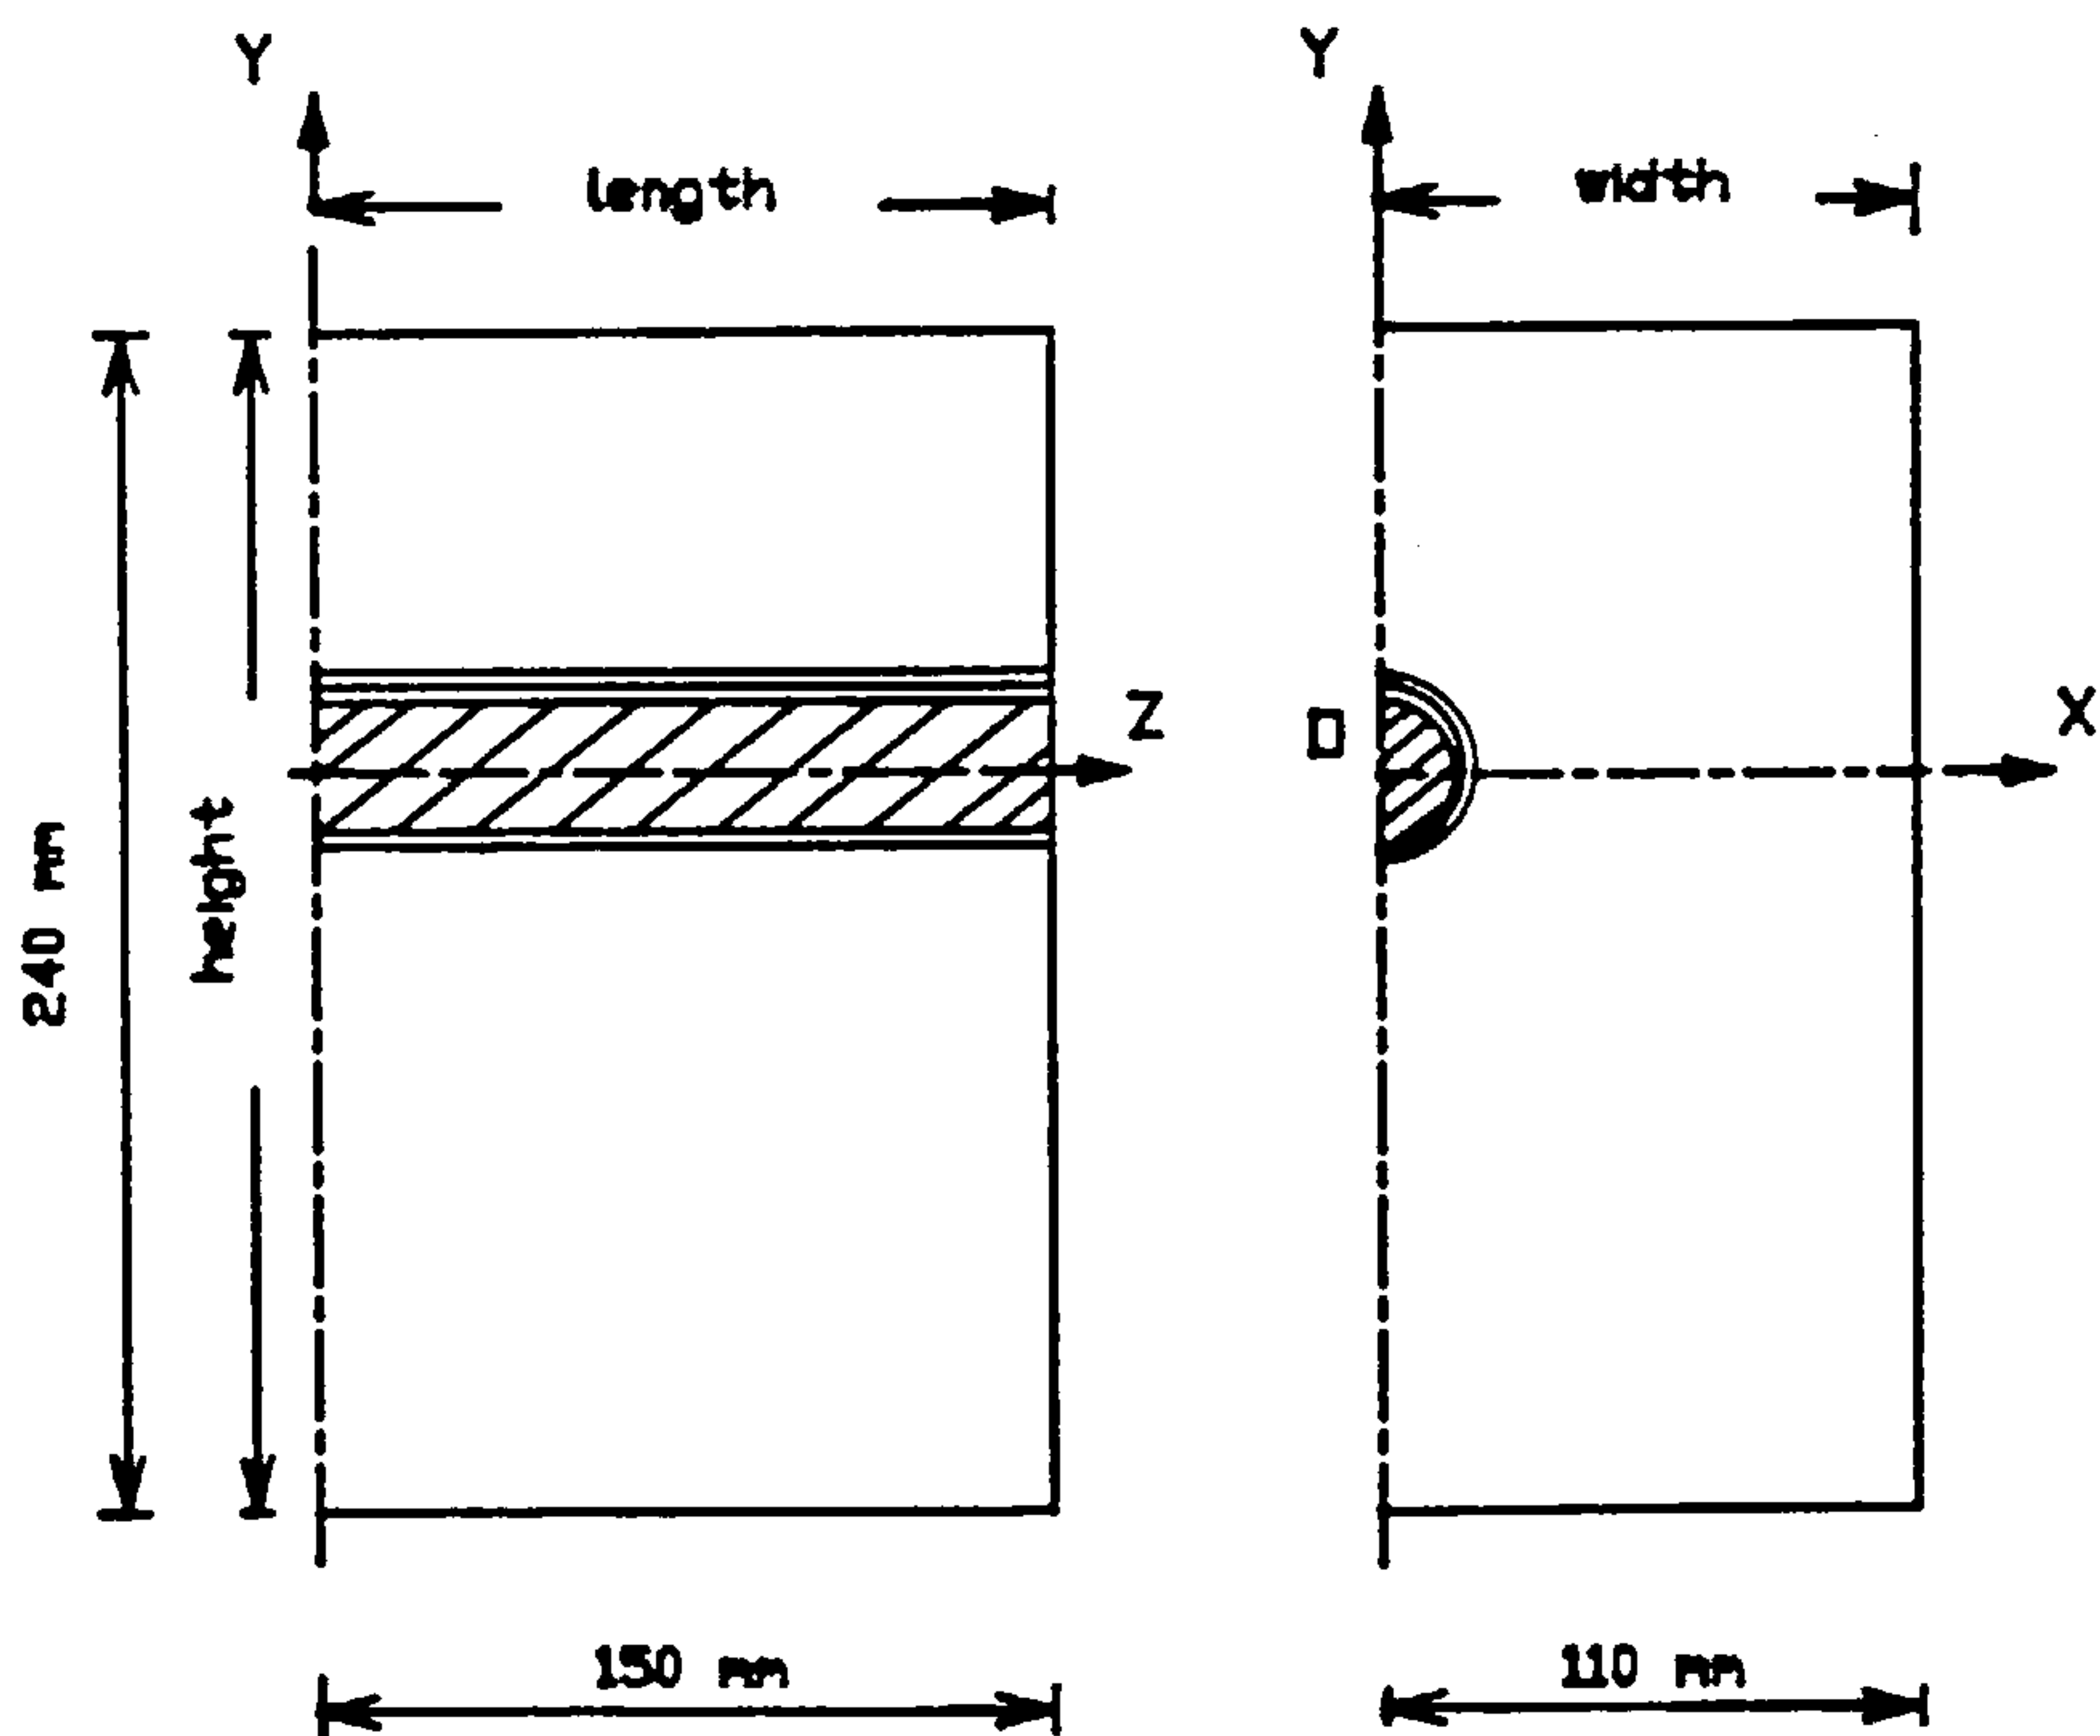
GEOMETRY AND DIMENSIONS OF THE MODELLED JOINT.
